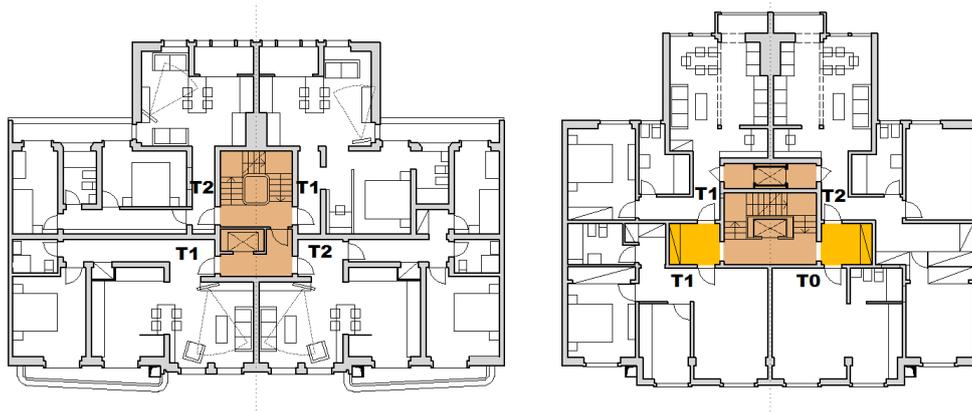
Left: building whose vertical access nucleus provides access to 4 dwellings on each floor without the need for any intervention work. Right: building in which an extension to the lobby has been created, since the main vertical access nucleus only provides access to two dwellings.
